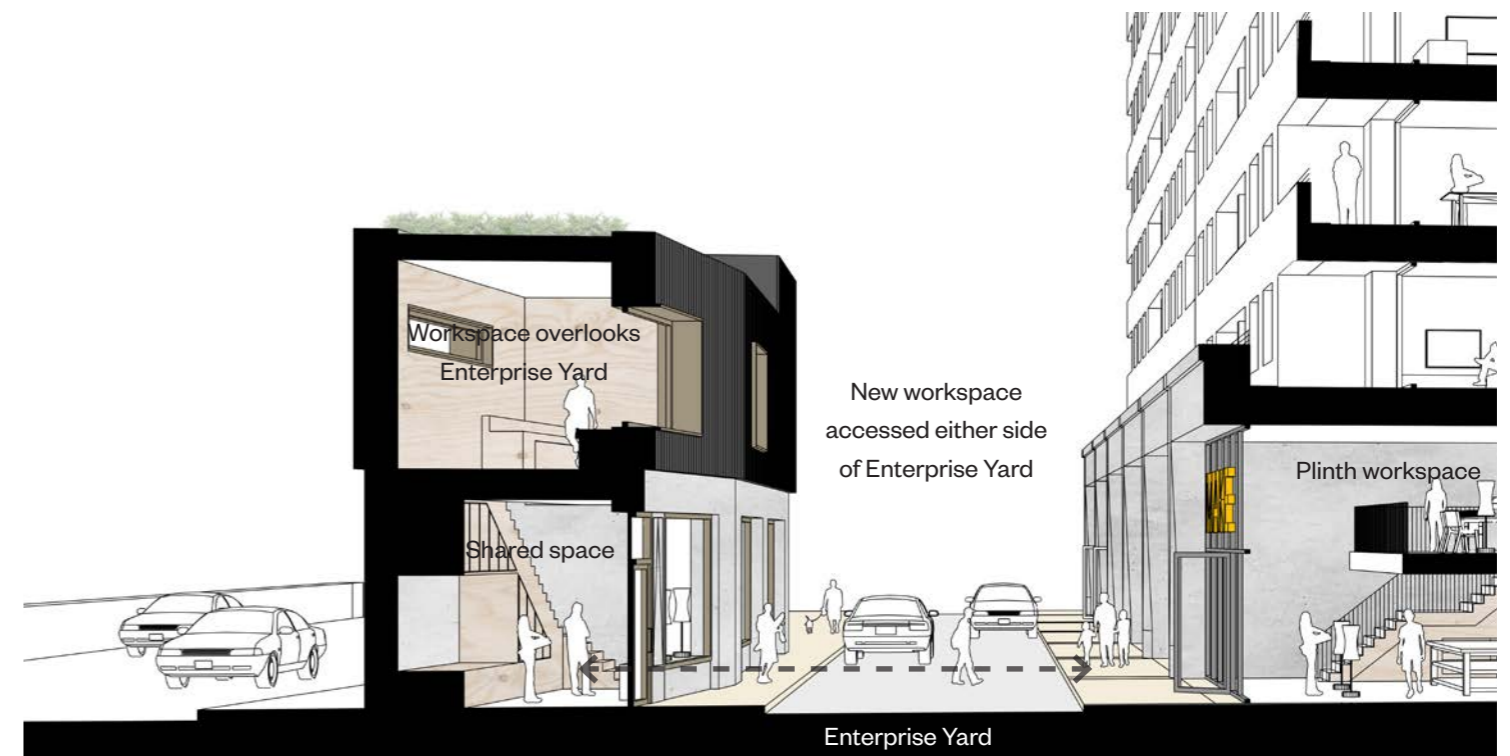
Sectional perspective illustrating the New Poplar Works buildings on Enterprise Yard
